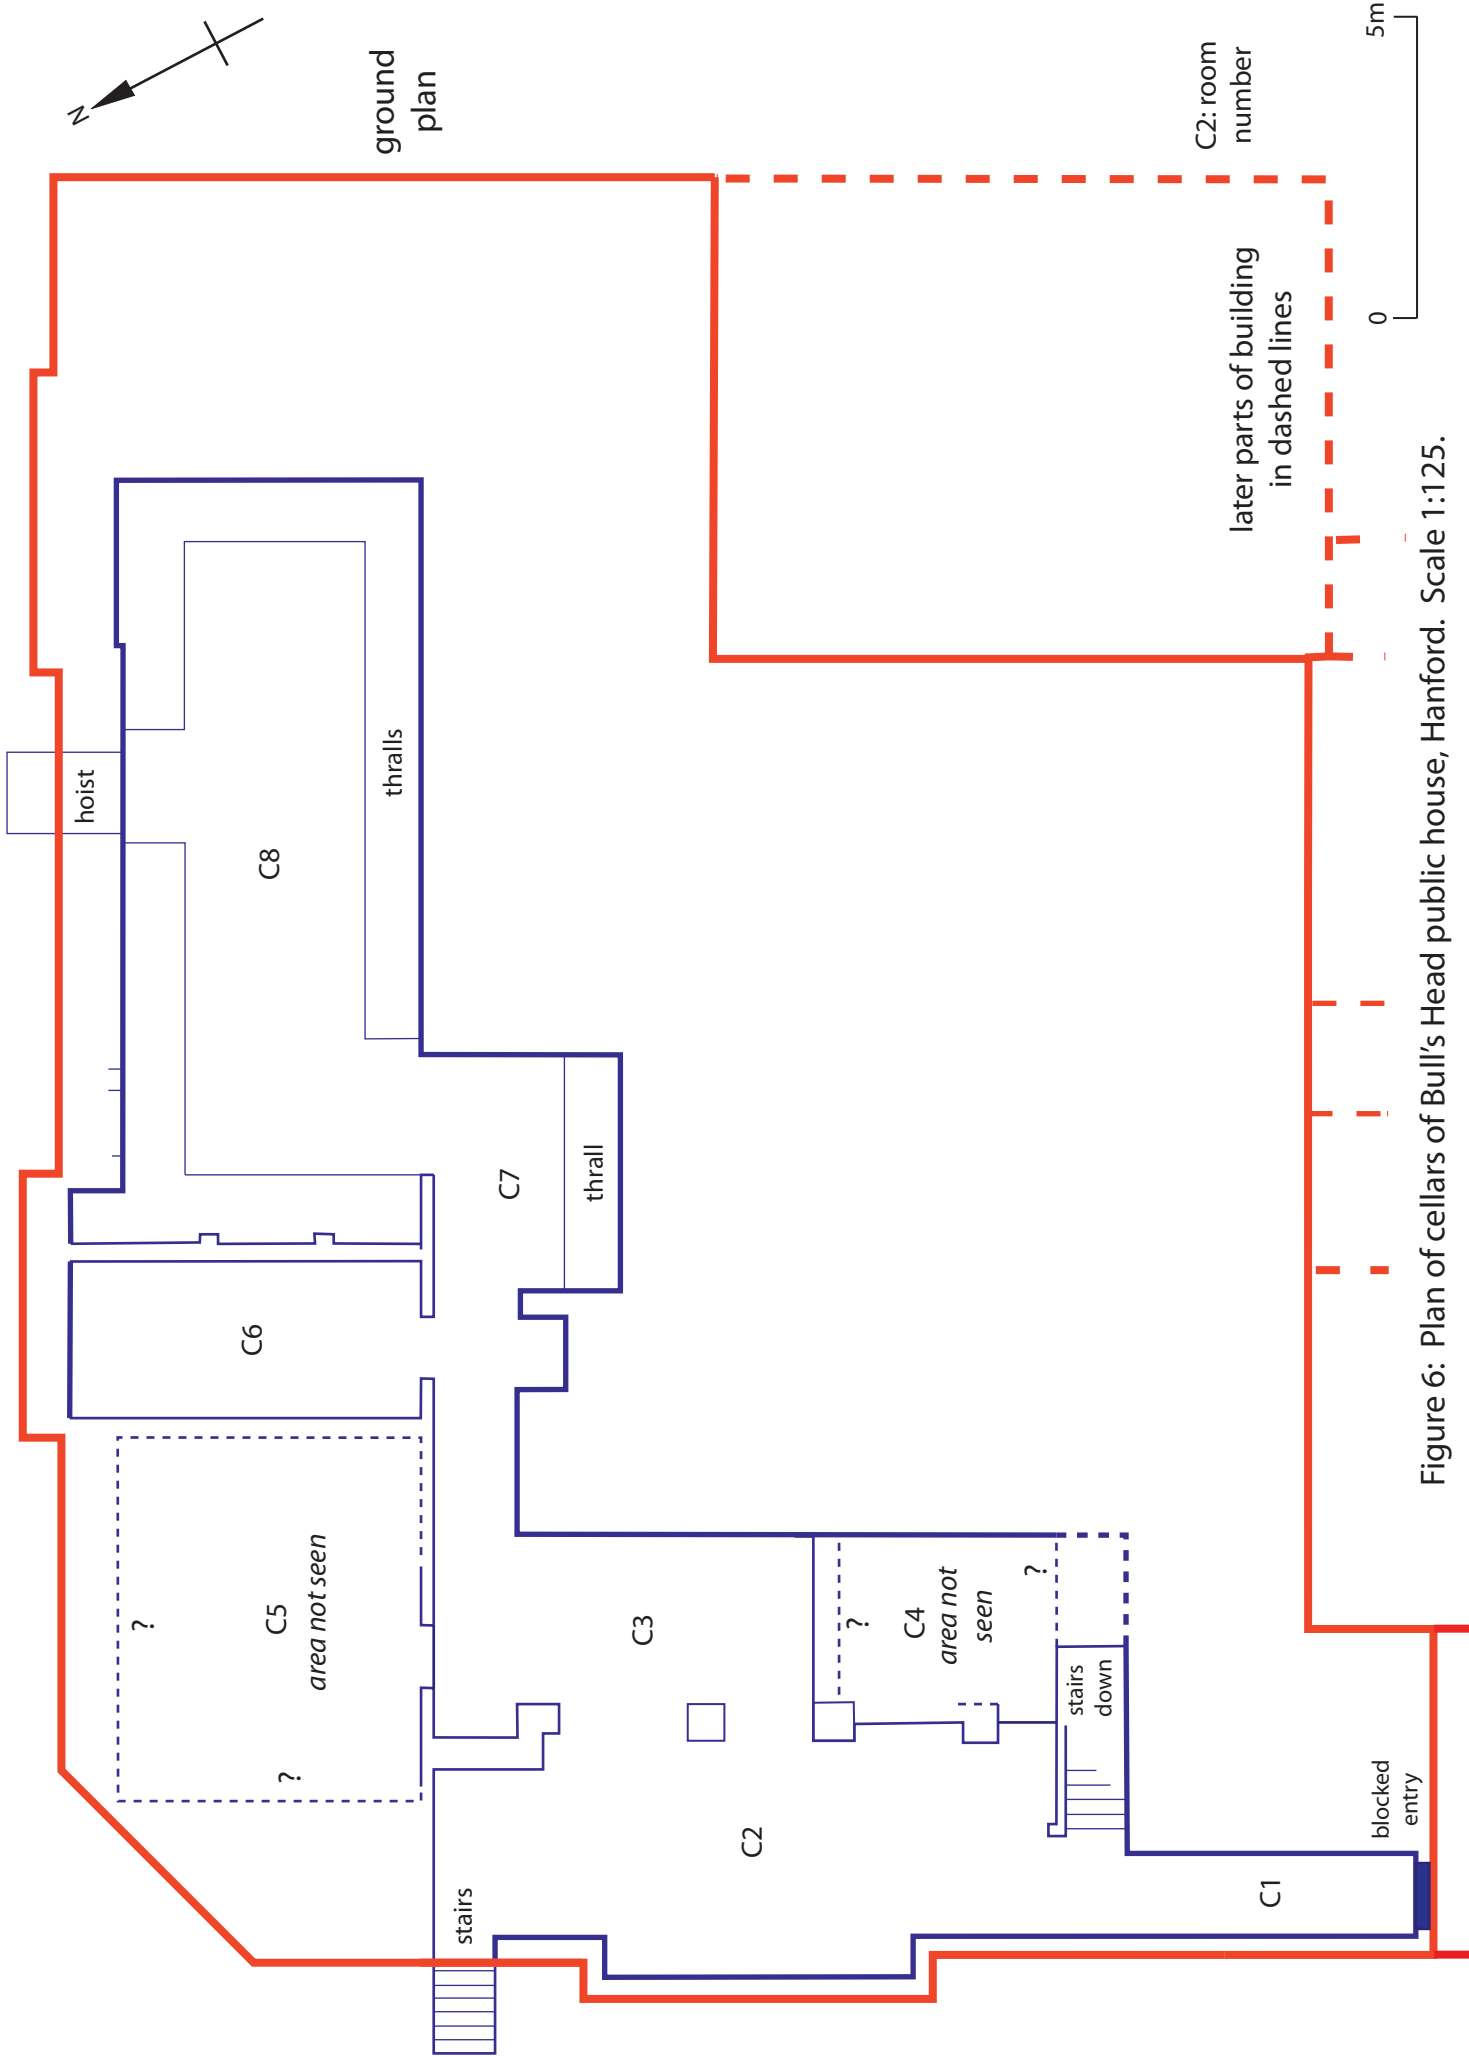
Plan of cellars of Bull's Head public house, Hanford. Scale 1:125.
